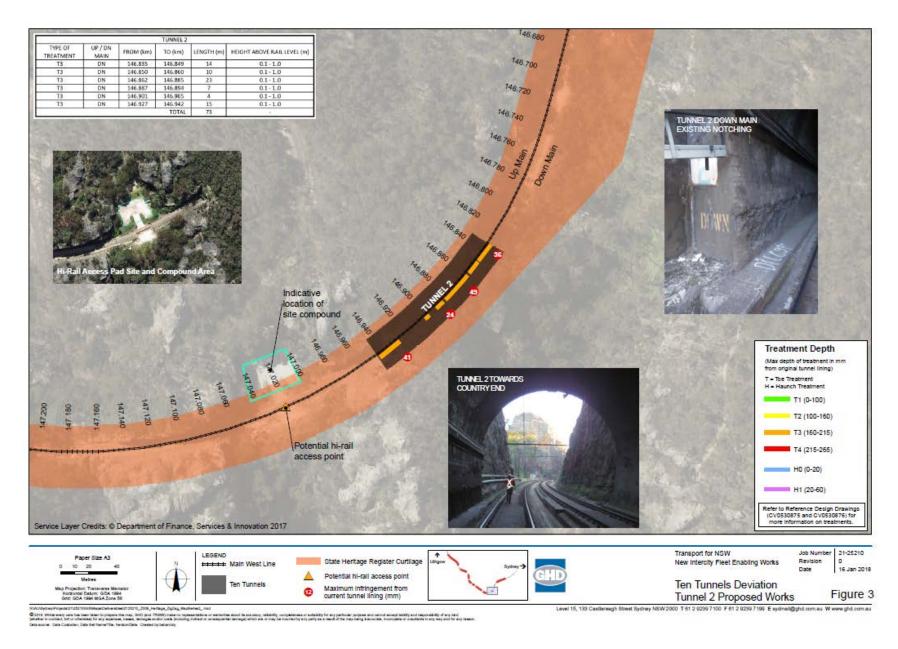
Proposed treatment overview for Tunnel 2 (GHD Great Zig Zag Railway deviation tunnels Heritage Design Summary 2018)
